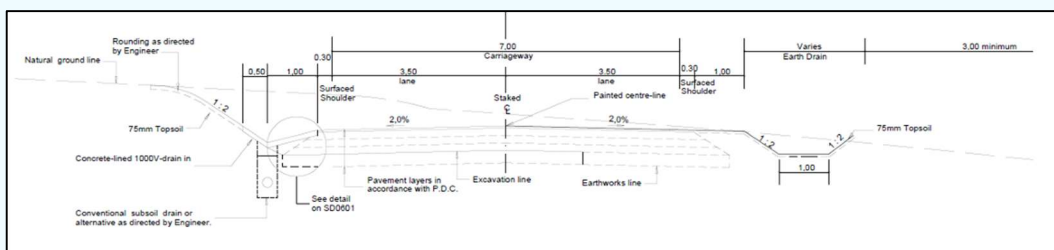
Typical Cross-Section Design for the DR3342 Road Upgrade.
